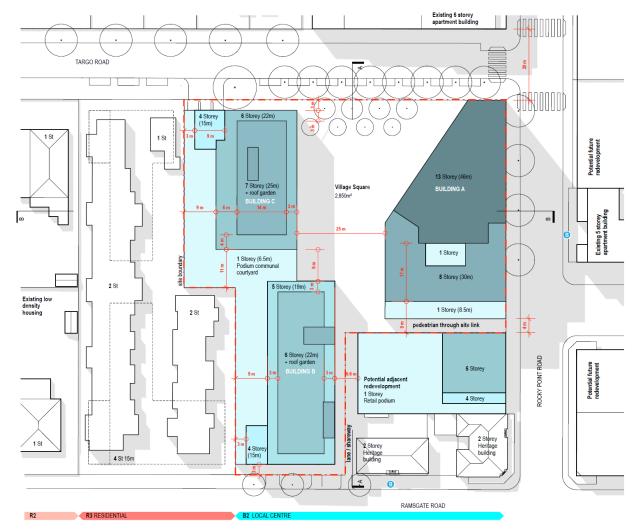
Building Envelope Plan of previously revised proposal (January 2019 lodgement)
